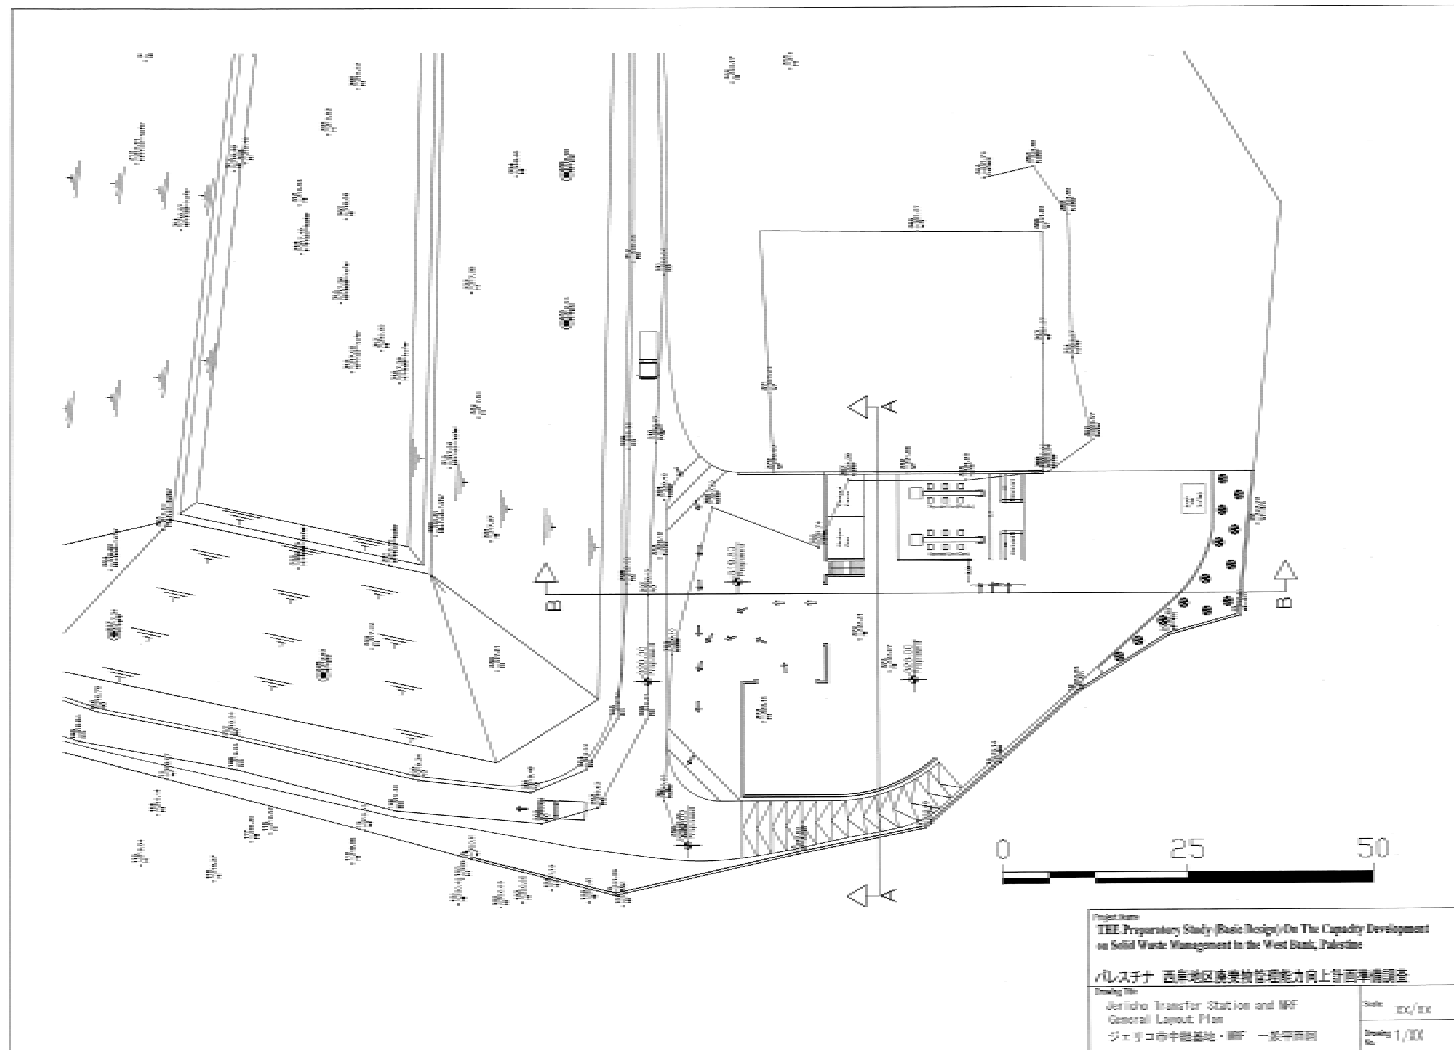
Layout Plan of Waste Transfer Station and MRF in Jericho
